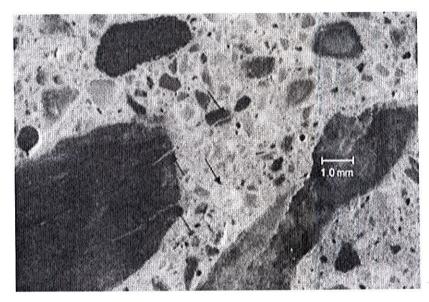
Photo 4 (see Appendix E page 176) Expansive ASR cracks on Core C4B
